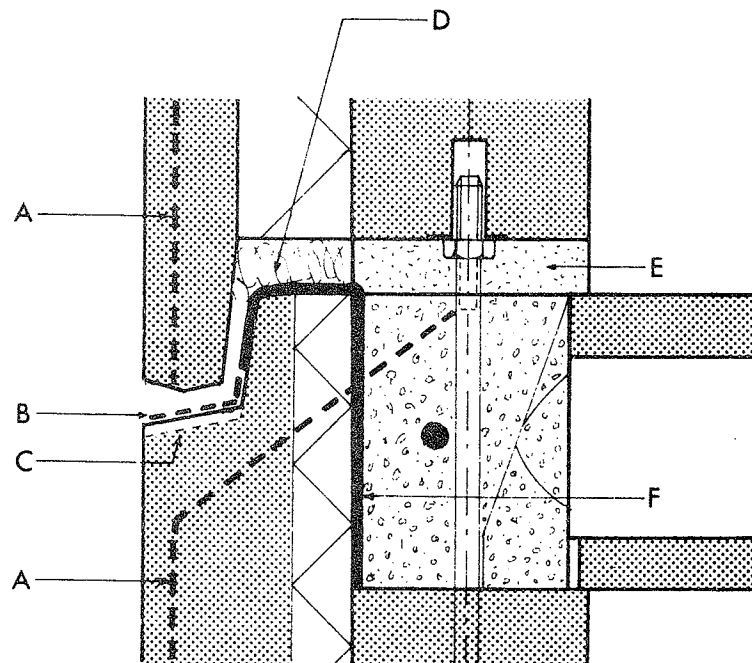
Overlapping, Horizontal Joint in Concrete Facade.
